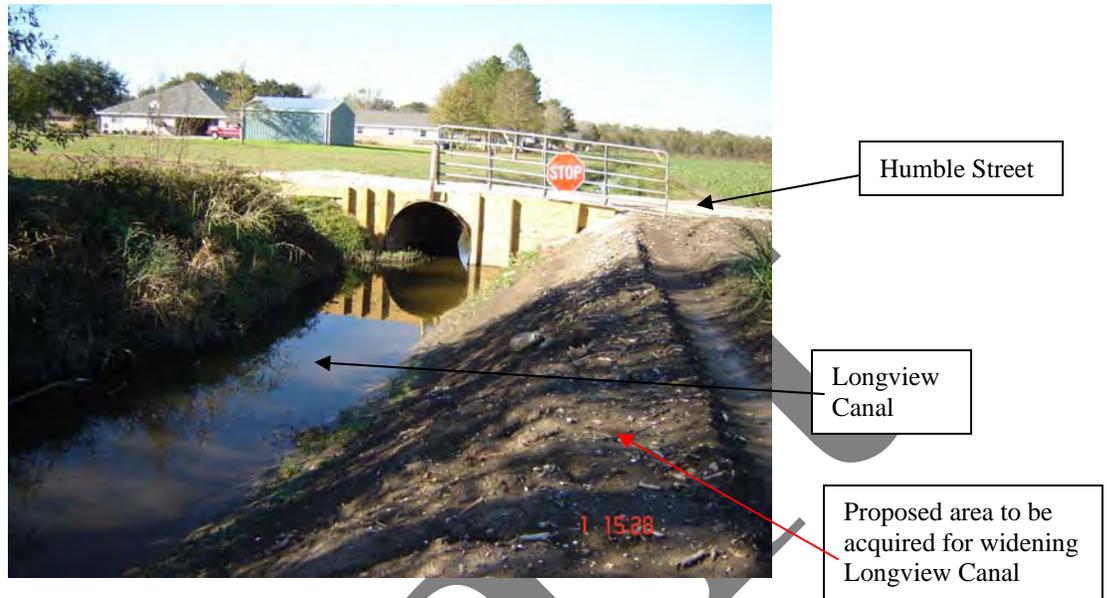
View of the existing C-6 culvert at Humble Street. This culvert would be replaced as part of the proposed project.
